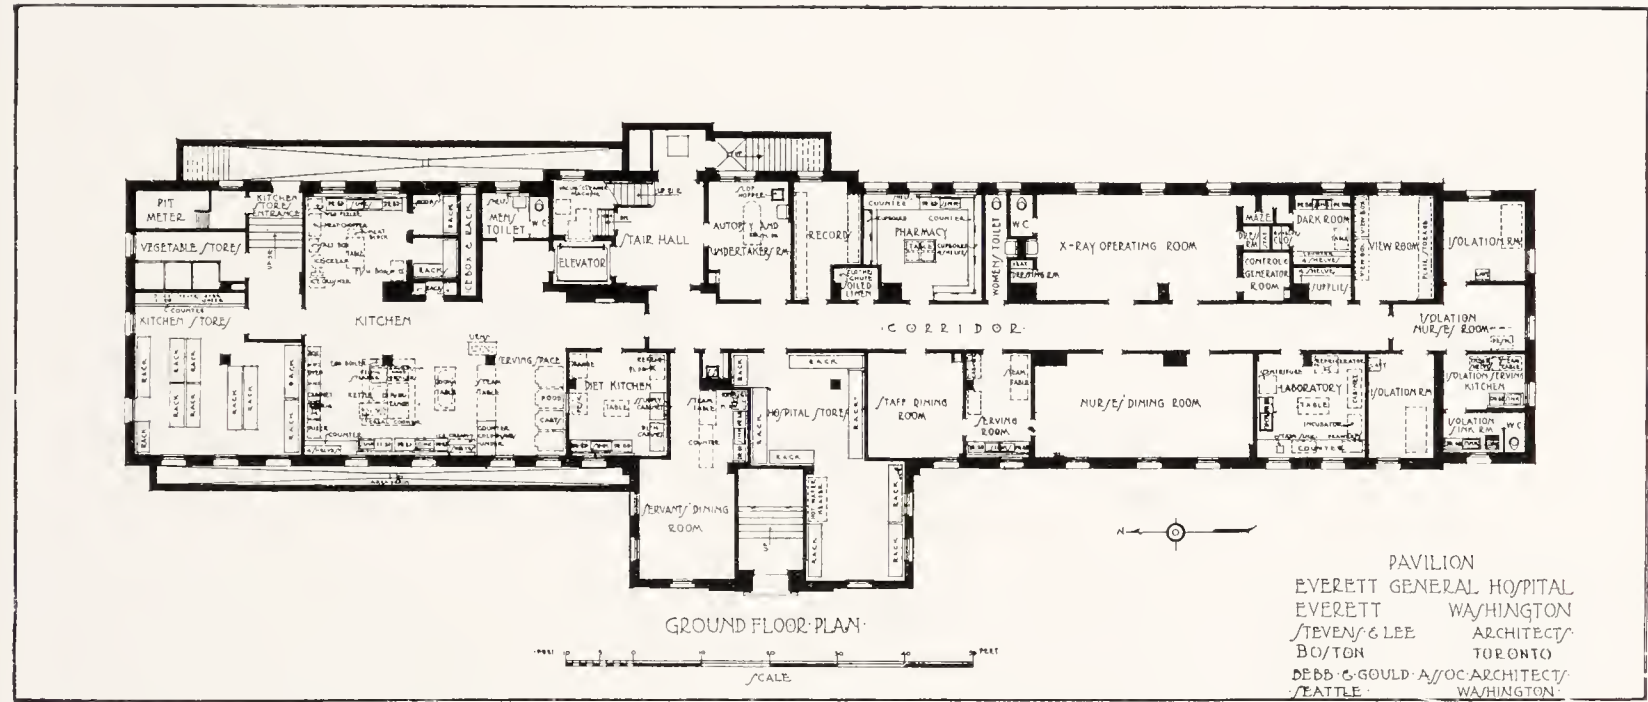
GROUND FLOOR PLAN, EVERETT GENERAL HOSPITAL, EVERETT, WASH.
